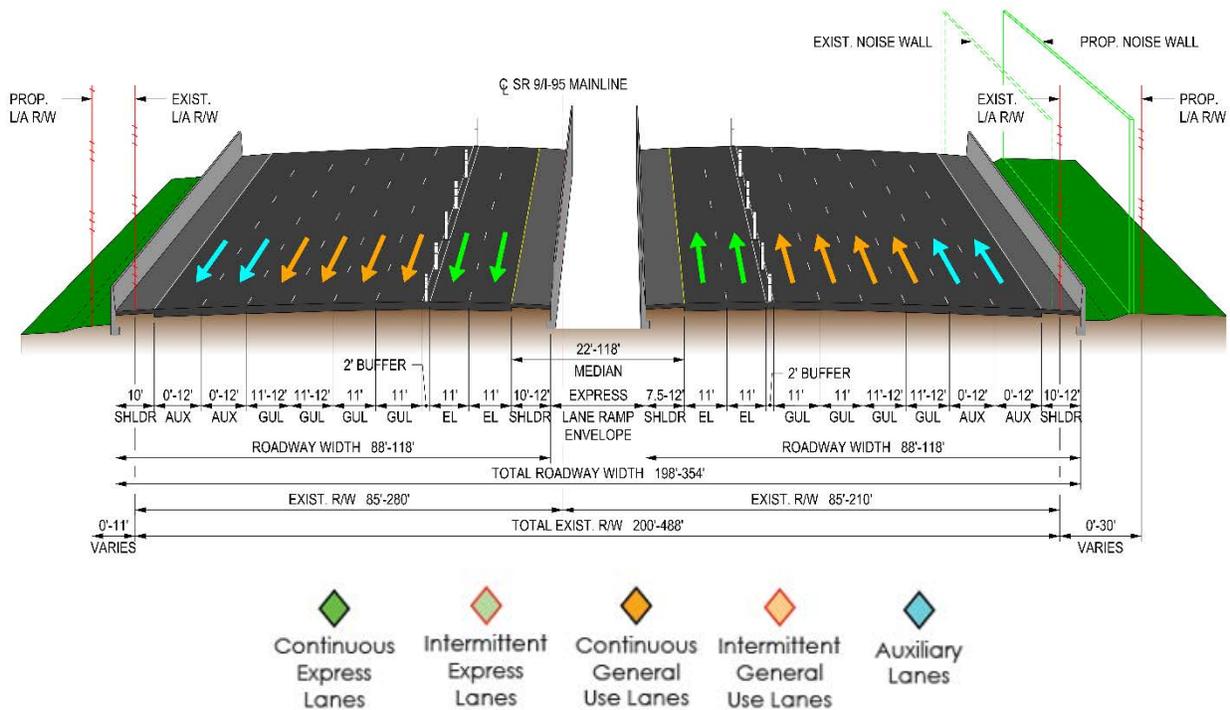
11: Proposed Typical Section - Alternative 3 – SR 9/I-95 Mainline and Express Lanes
